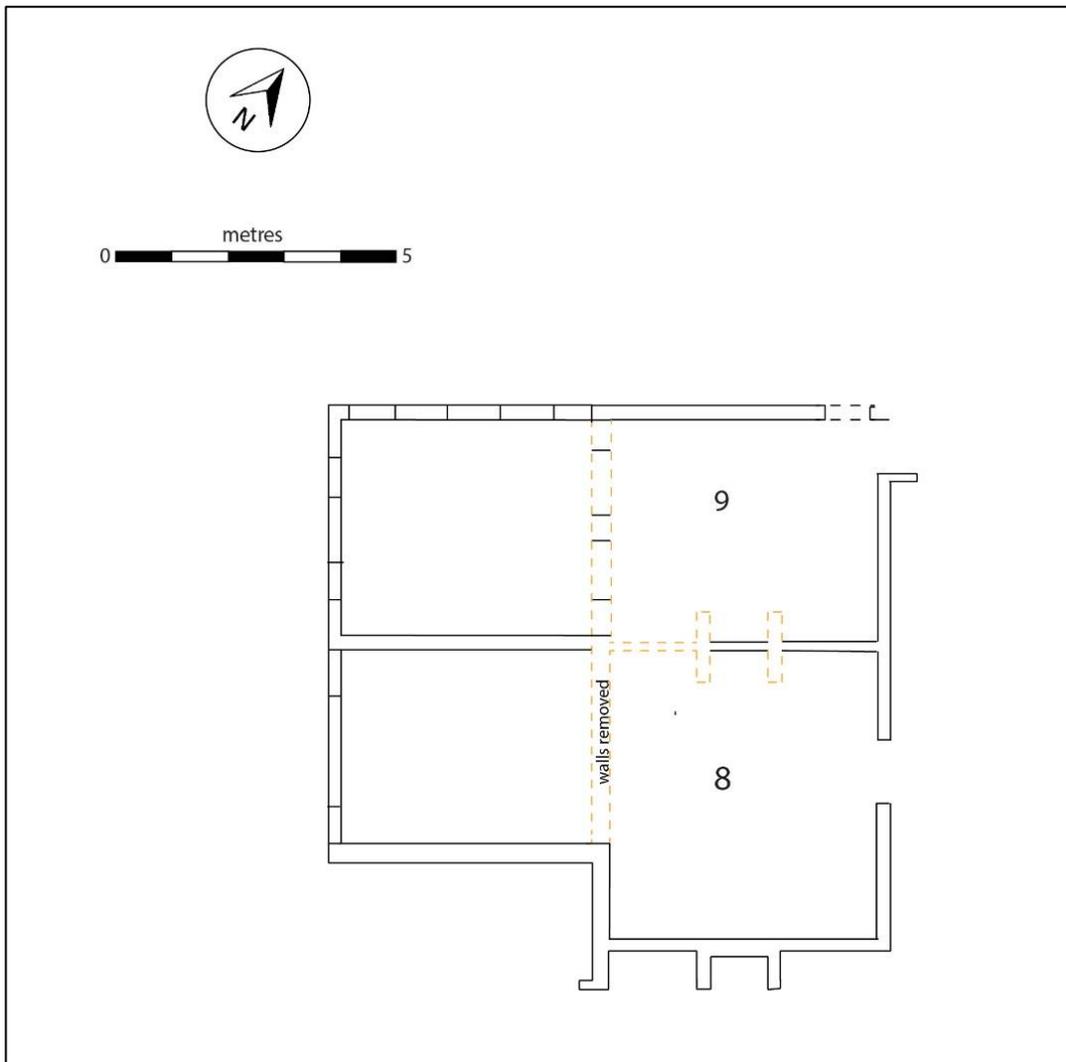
Floorplan of the Phase 5 changes to Rooms 8 and 9. For location refer back to Figure 4-1.
